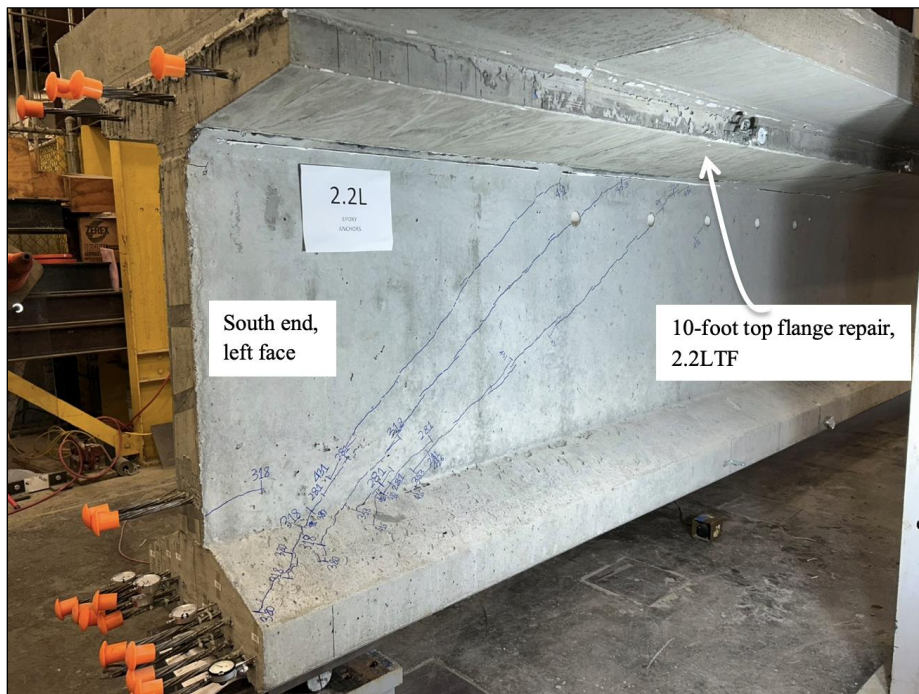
Photo. Test 2.2.S (repair 2.2LTF) shear cracks on repaired face, not extending into top flange repair 2.2LTF (left face of girder pictured).
